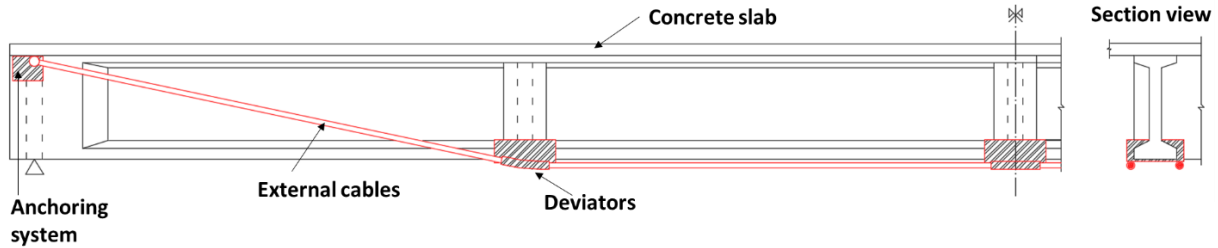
Strengthened configuration of the cross-section of the case-study prestressed reinforced concrete girder through external post-tensioned cables.
